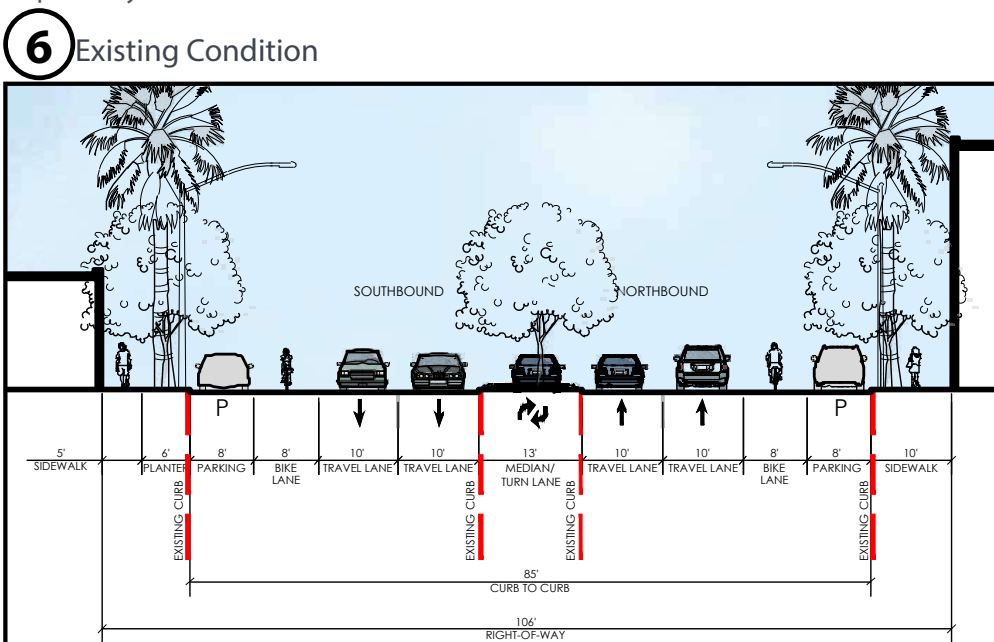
, Carlsbad Boulevard: Existing Conditions Section (Christiansen Avenue to Beech Avenue)
